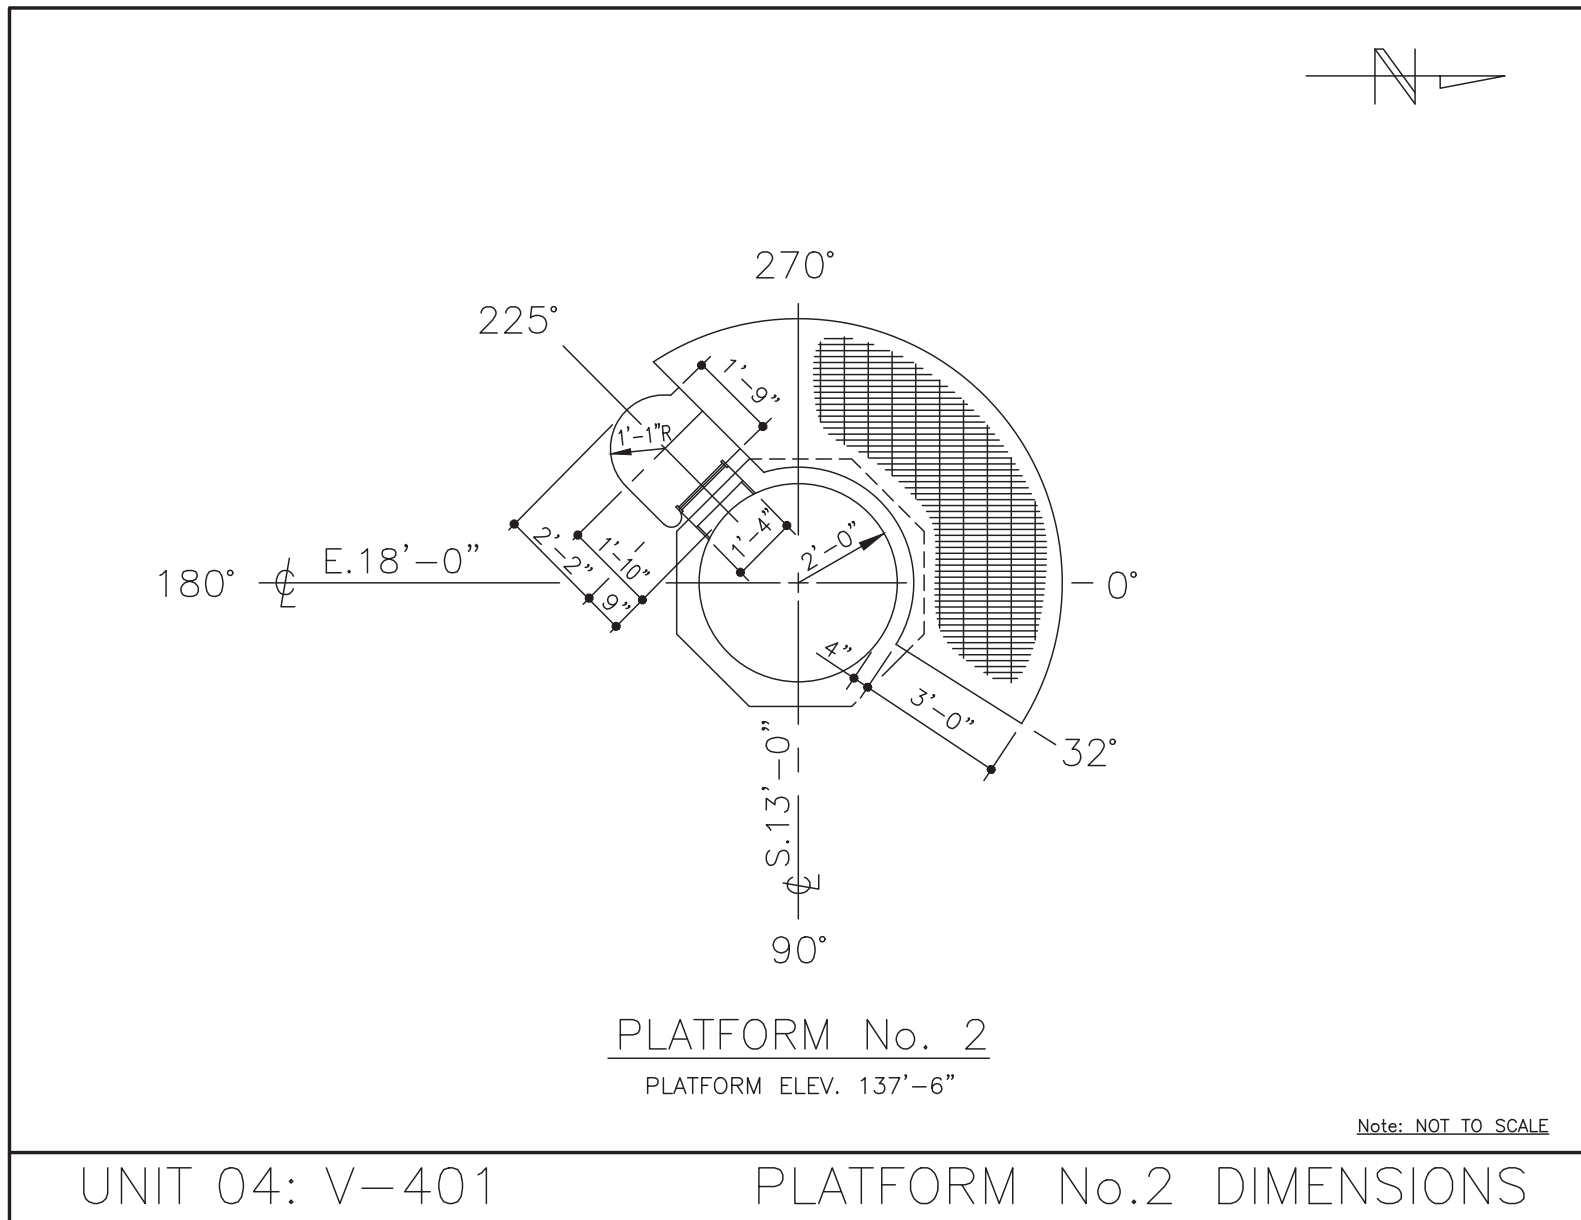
Unit-04: Column 04-V-401 Platform No. 2 Dimensions.
